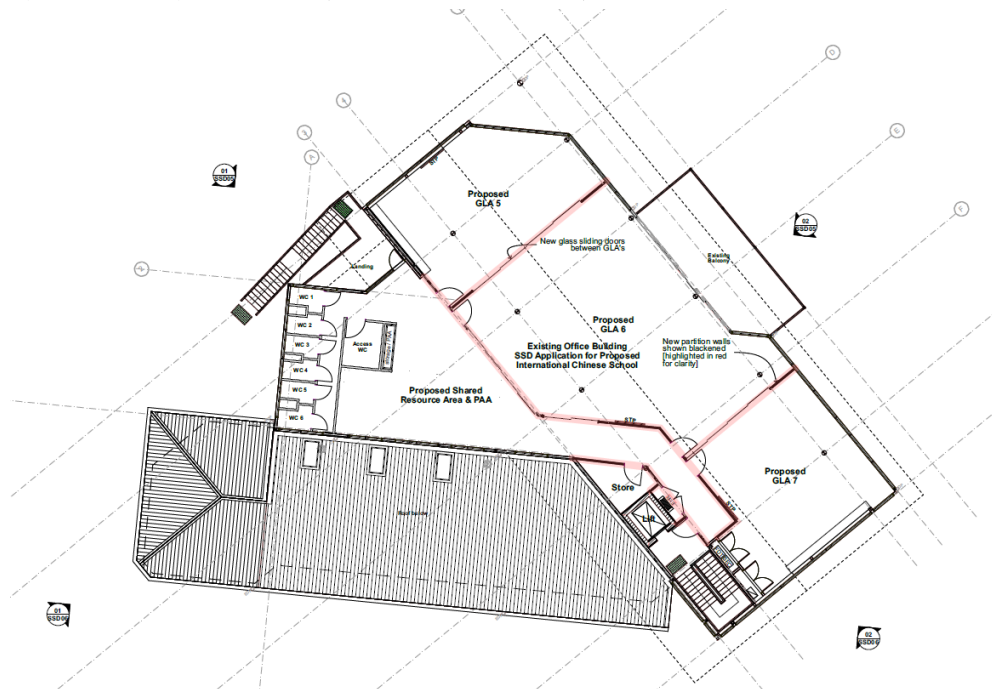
Proposed first floor plan. (Source: Stanton Dahl Architects)
